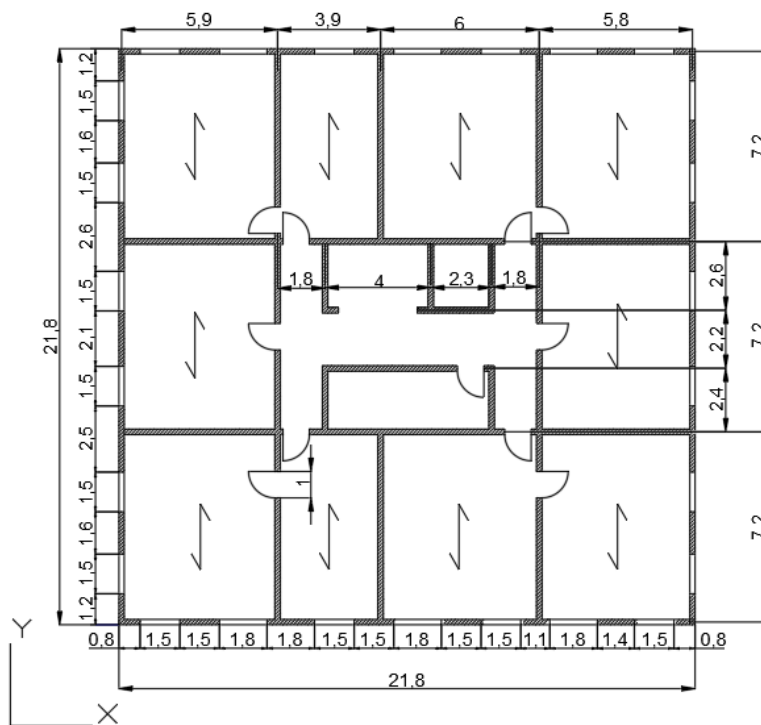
Floor plan of the building with dimensions [m] and x,y coordinate system.
